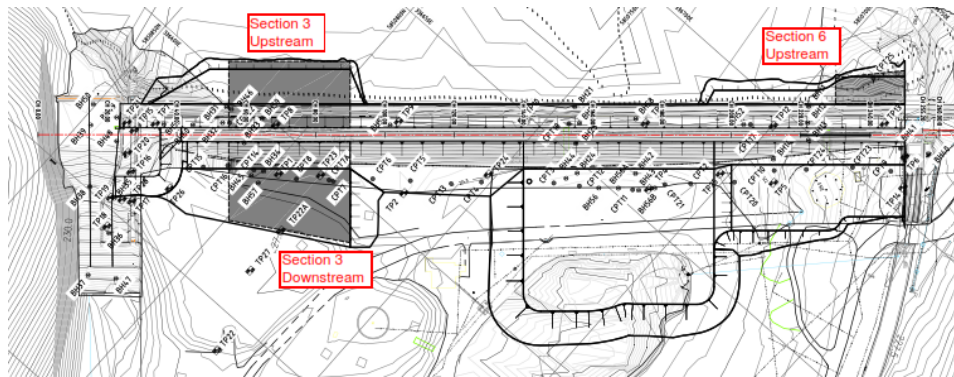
Layout Plan of Geotechnical Investigation Locations and Remedial Sections
